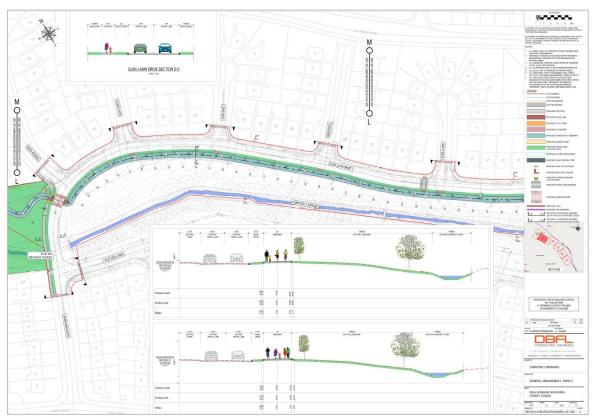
Proposed Route - Section B [DBFL Drawing No 230119-X-0100-Z00-DTM-DR-DBFL-CE-1202 General Arrangement - Sheet 2]
